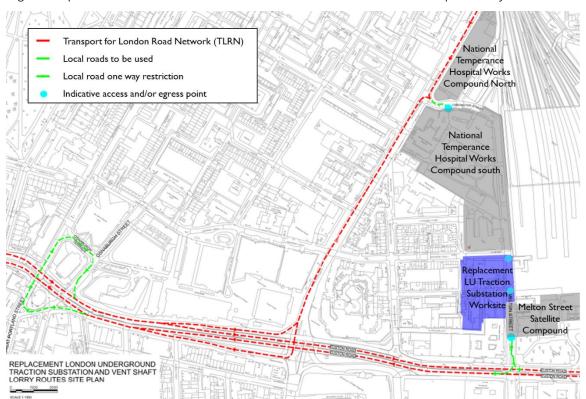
Replacement LU Traction Substation and Vent Shaft Worksite Location and Proposed Lorry Routes
